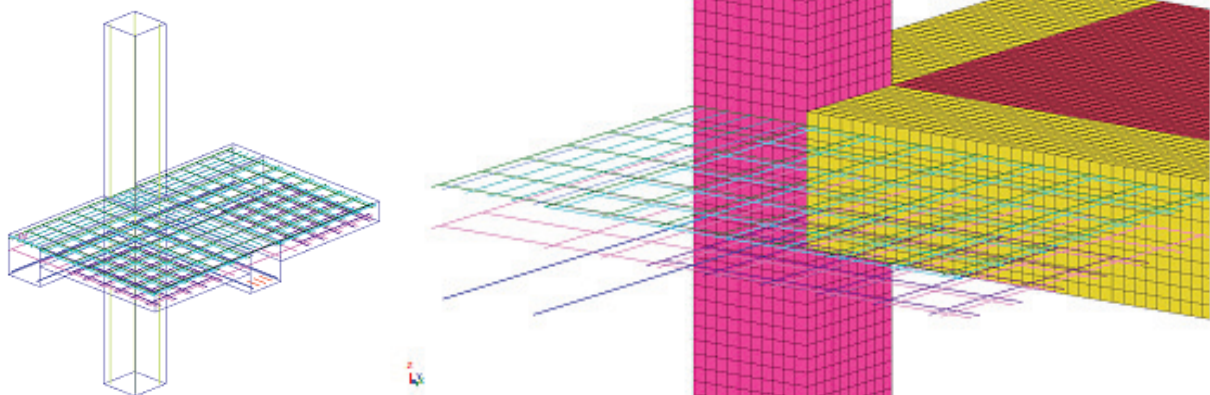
Reinforcement of the junction between the column, beam and ribbed floor slab in the structural model
